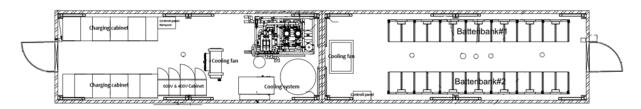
Floor plan for the technical building. Provided by Boreal.
